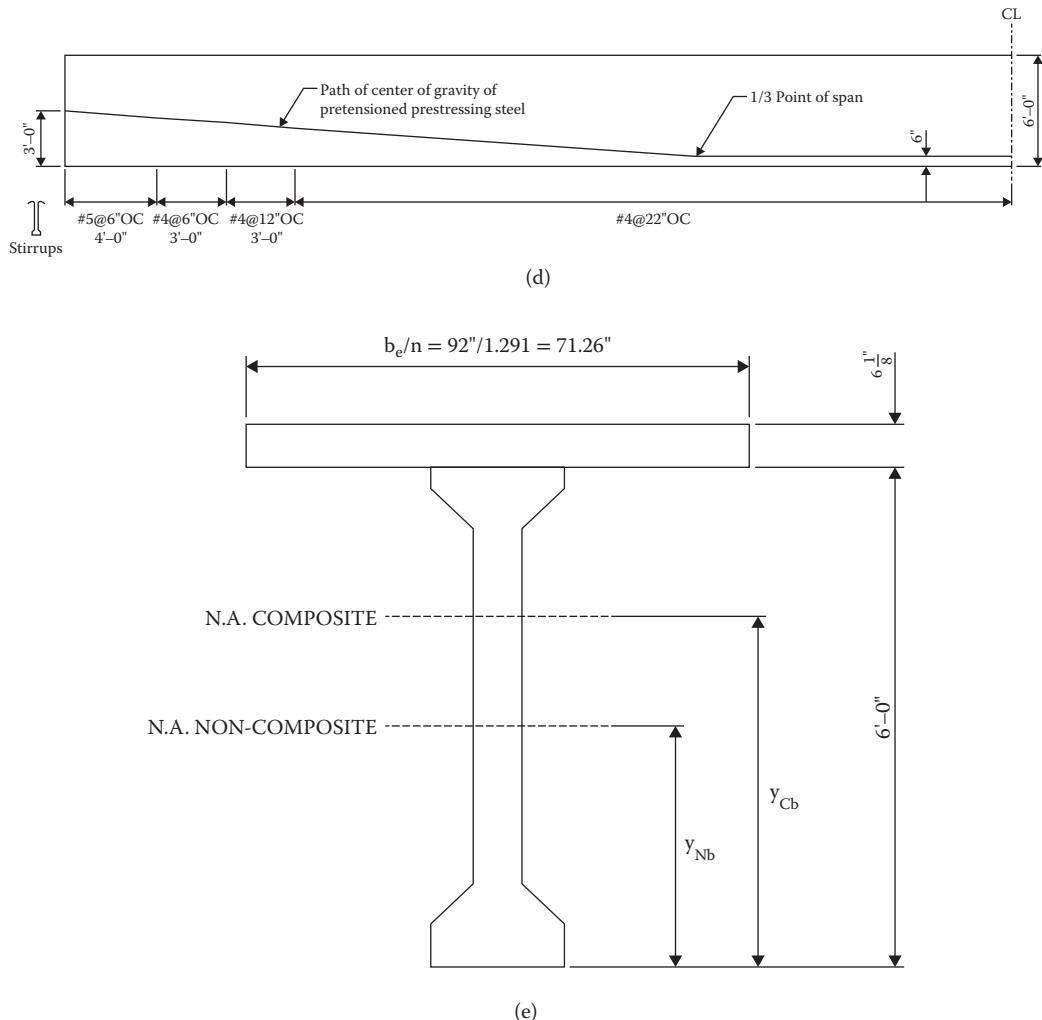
(Continued) Details of simply-supported precast prestressed concrete I-girder bridge example: (d) precast girder prestressing tendon profile and stirrups details and (e) composite section.
